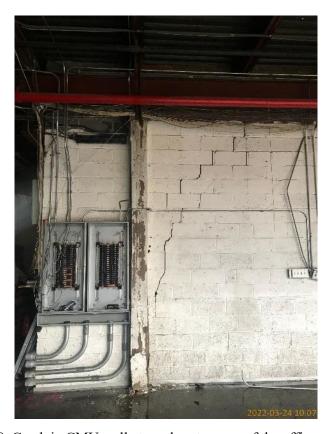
Crack in CMU wall at southeast corner of the office enclosure.
